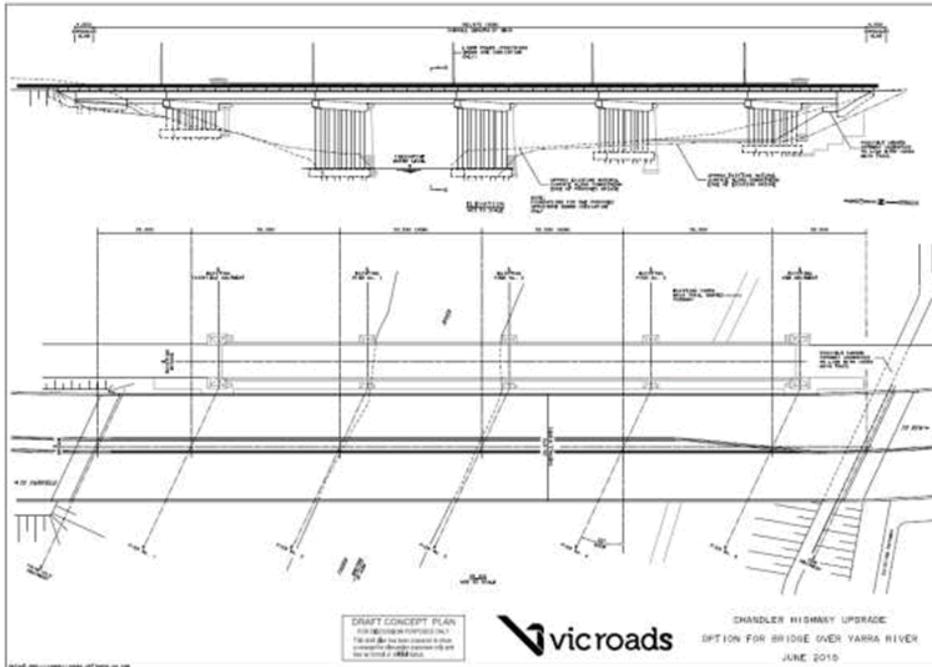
Plan and longitudinal elevation showing relationship between old and new structures (source VicRoads)
